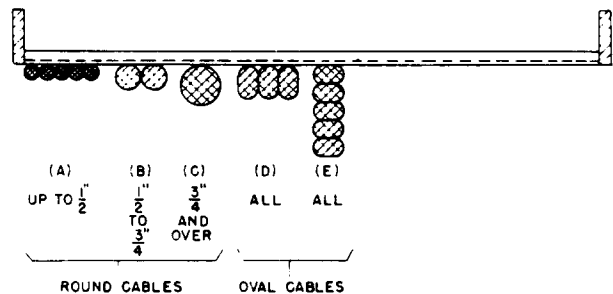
Number of Cables Under One Stitch on Vertical Runs and Inverted Horizontal Runs on Cable Racks
